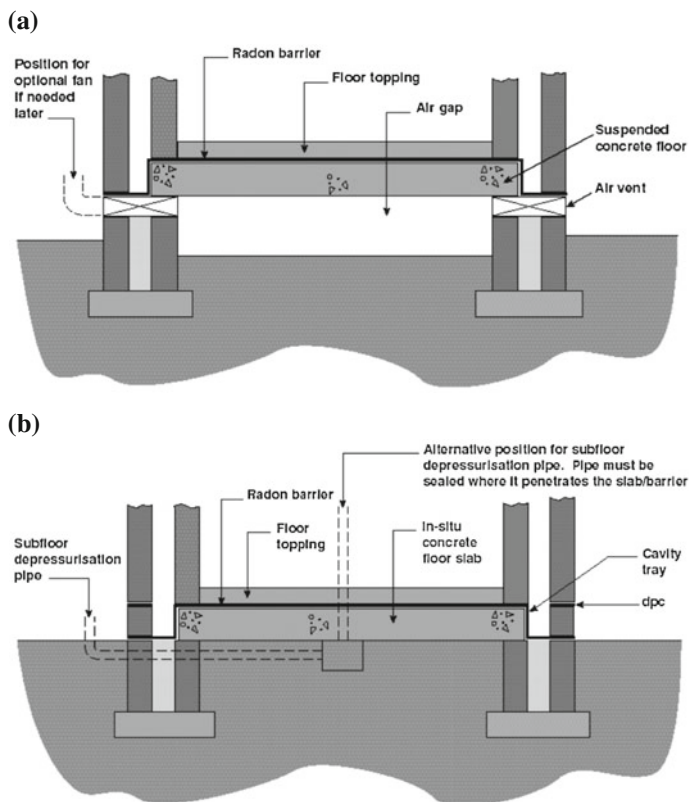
Radon protection: a to a suspended concrete floor and b to a ground bearing concrete floor slab (Scivyer 2001)
